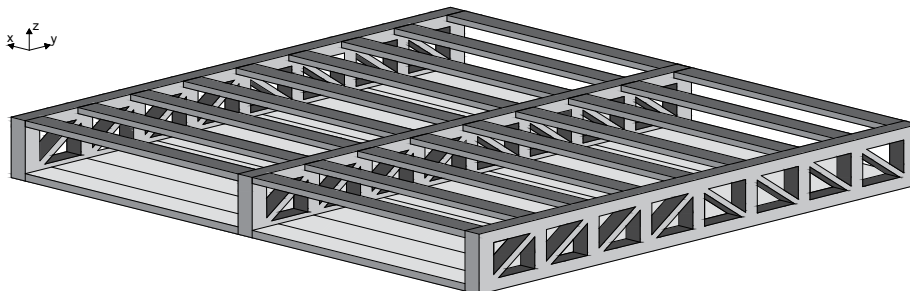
Indication of a box bridge structure in which the high side girders are connected at the top
